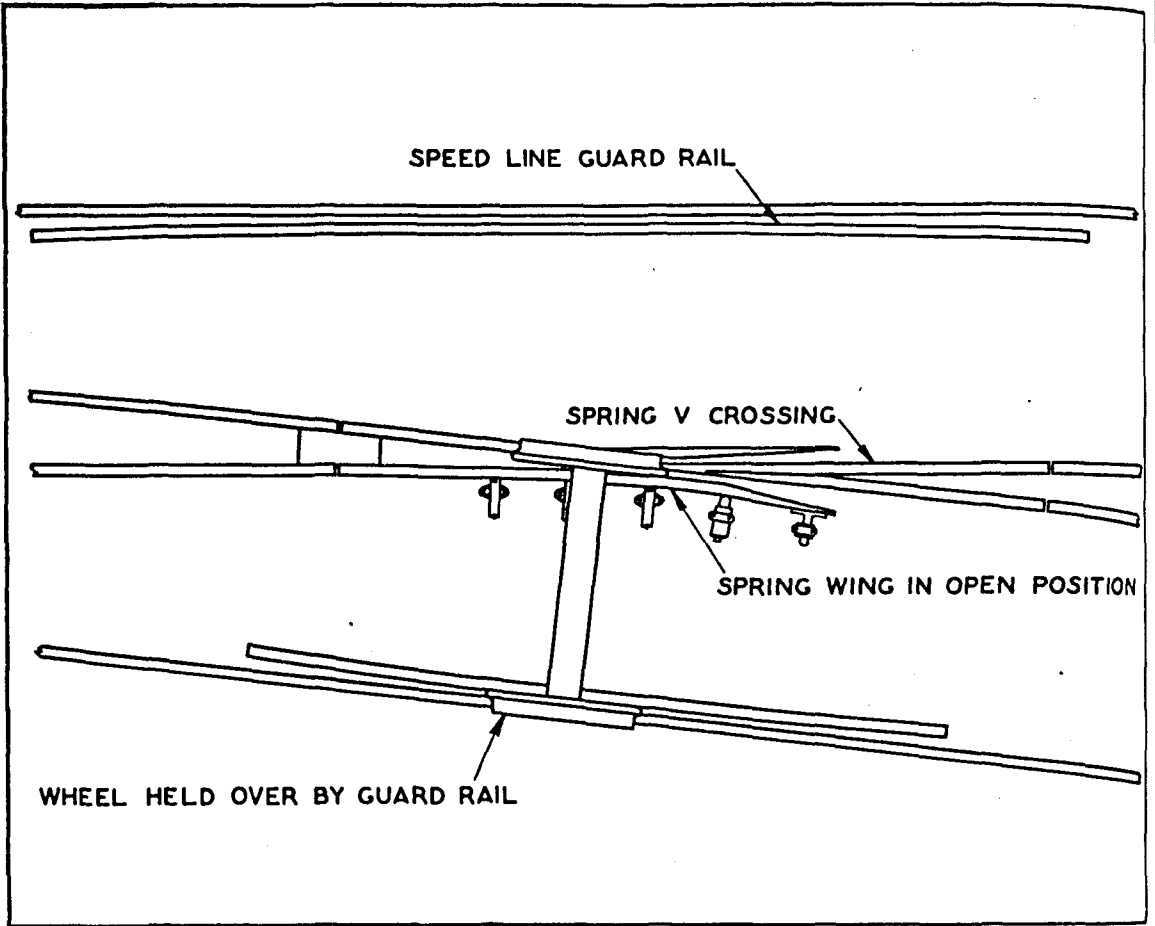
SPRING V CROSSING. SPRING WING IN OPEN POSITION.
